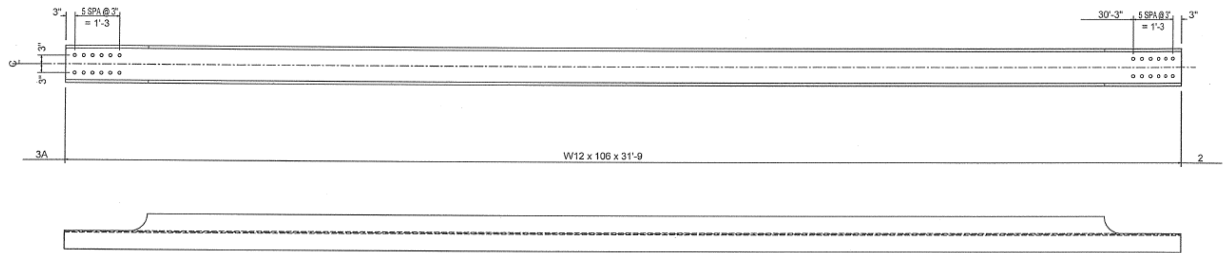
W12x106 Drawings, Displaying Cope and Hole Arrangement (Drawing Courtesy of Fought and Company)
